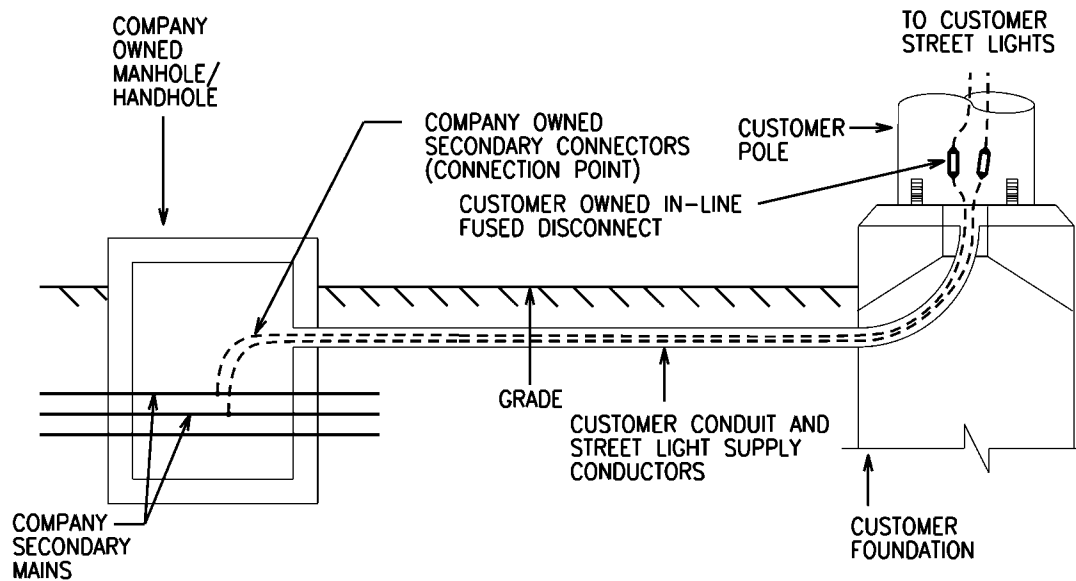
Connection of Underground Supplied Customer Owned Street Light to National Grid Handhole or Manhole – Non-Standard Connection
